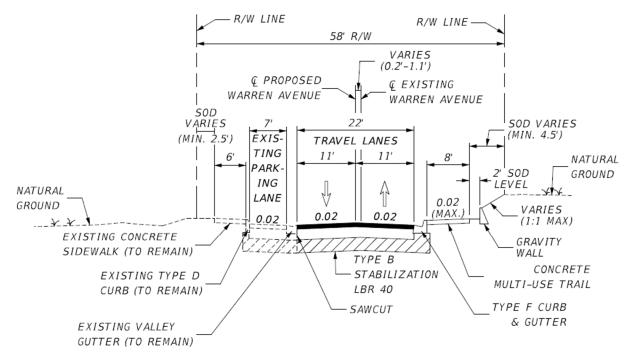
Alternative 2 Typical Section from 700 ft West of Milwee Street to 440 ft West of Milwee Street
